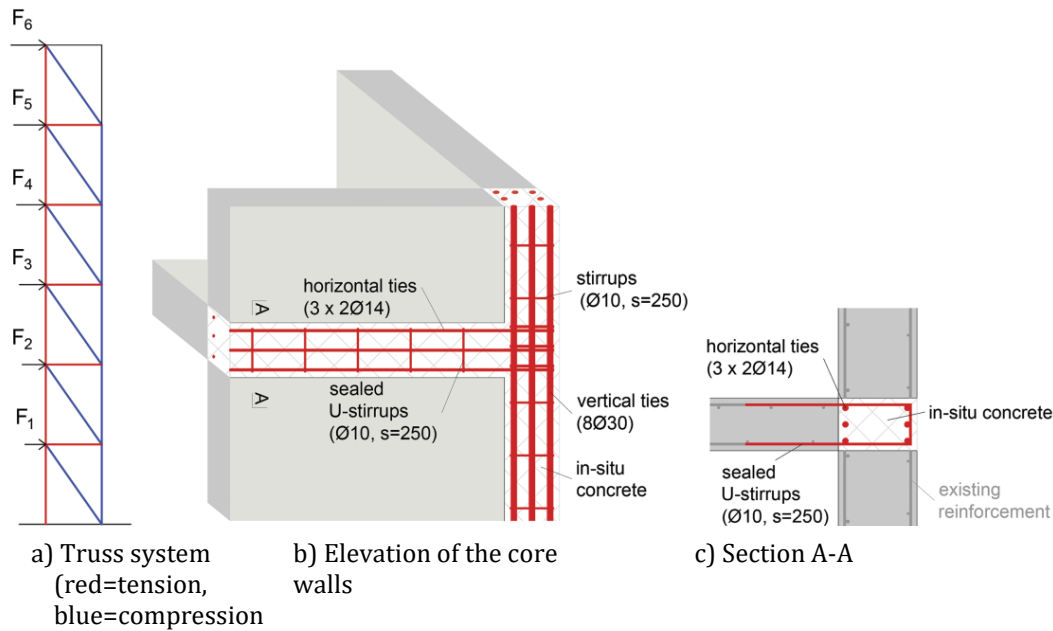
Bracing system for reclaimed concrete elements. (Widmer et al., 2023)
